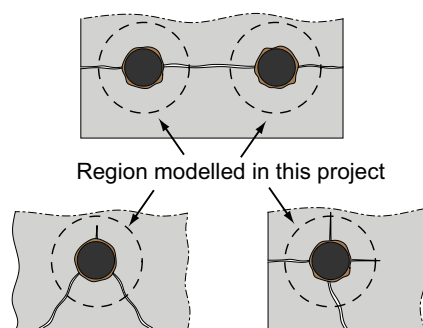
Possible cracks patterns in reinforced concrete due to corrosion.
